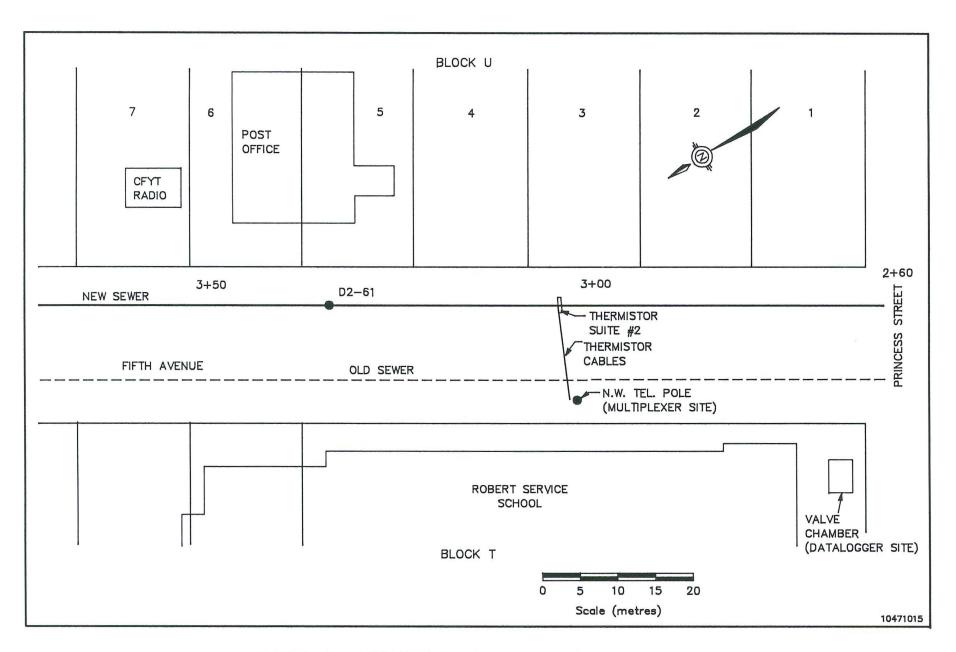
LOCATION PLAN - THERMISTOR SUITE #2 FIFTH AVENUE AT ROBERT SERVICE SCHOOL
